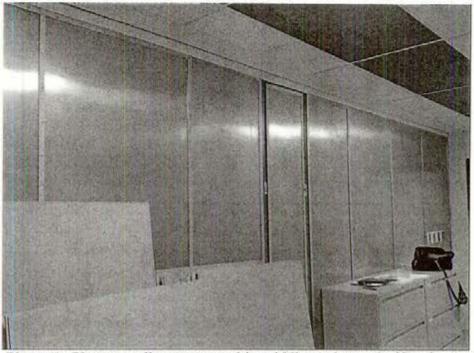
Plenum wall, access panel in middle, and stored office furniture.
